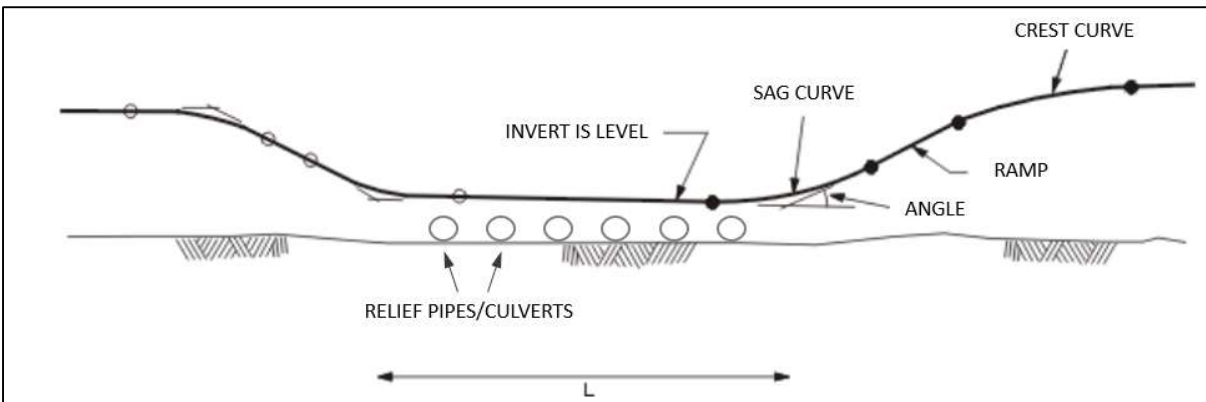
Long Section of Typical Floodway (adapted from Main Roads Western Australia (2006))
